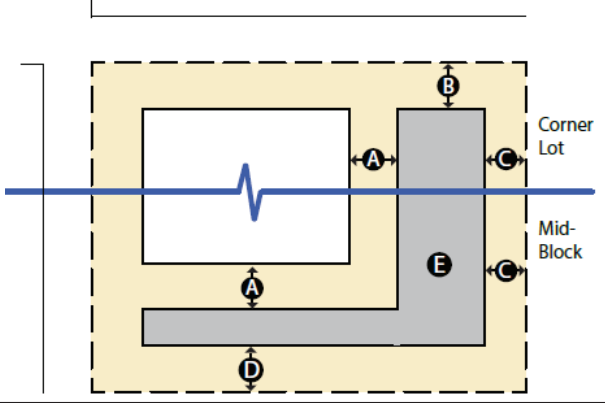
Retaining and Perimeter Wall Standard Stepback
